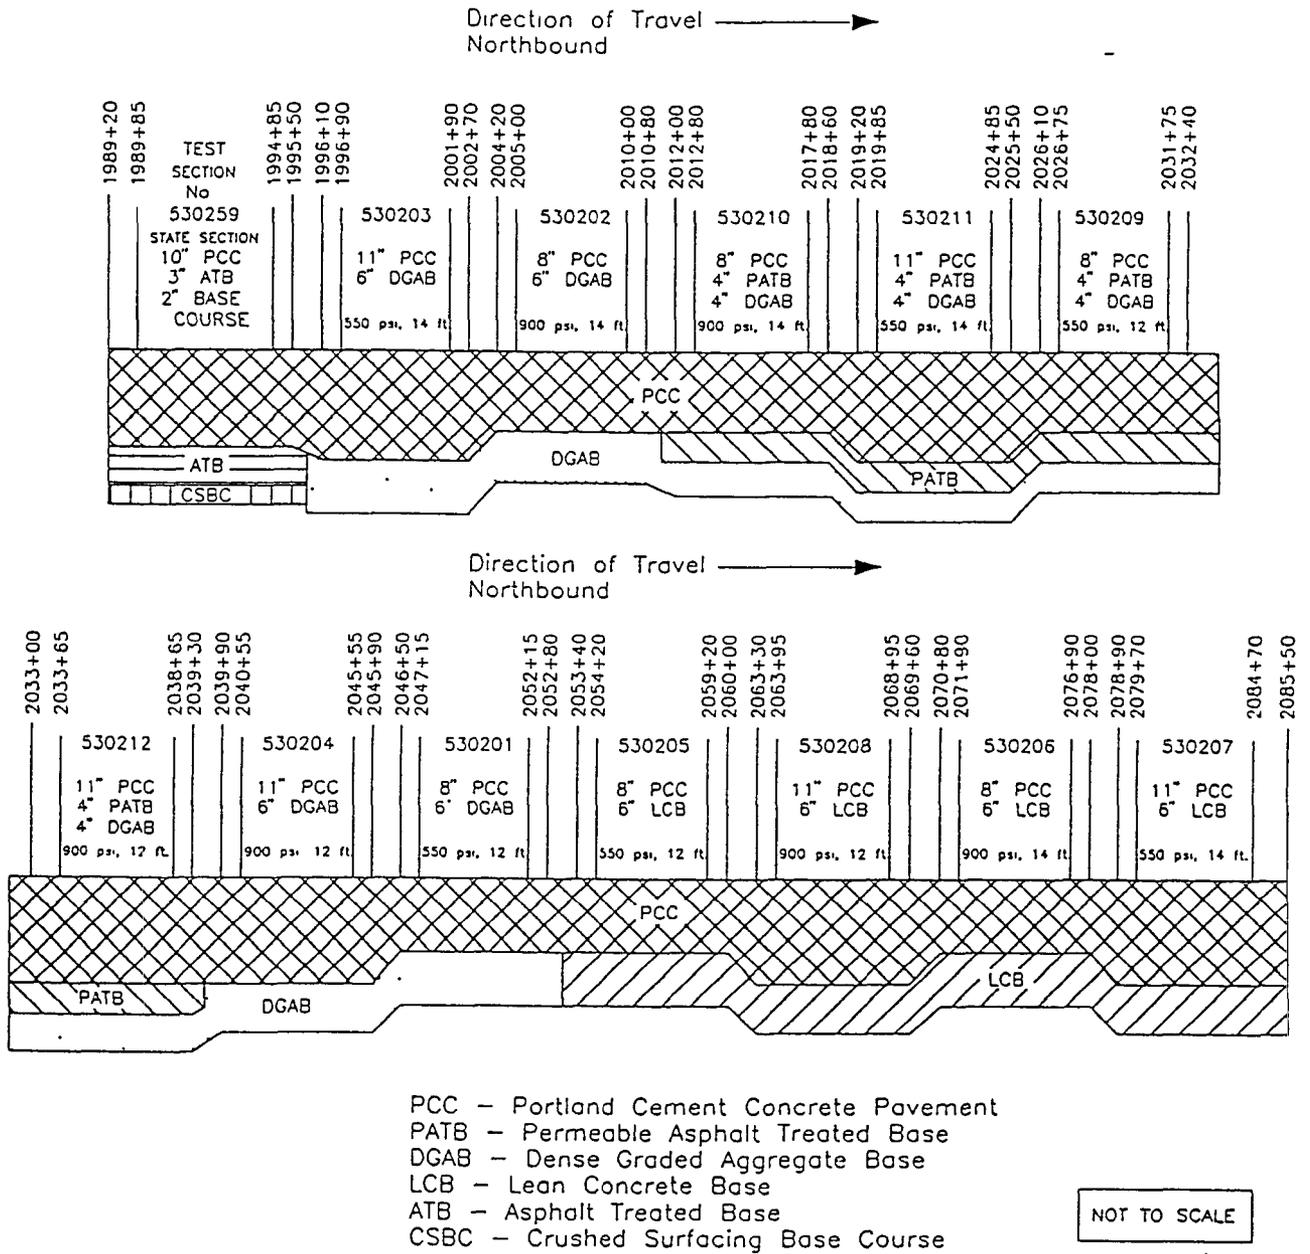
Layout of experimental test sections, Washington SPS-2 project, SR 395.
